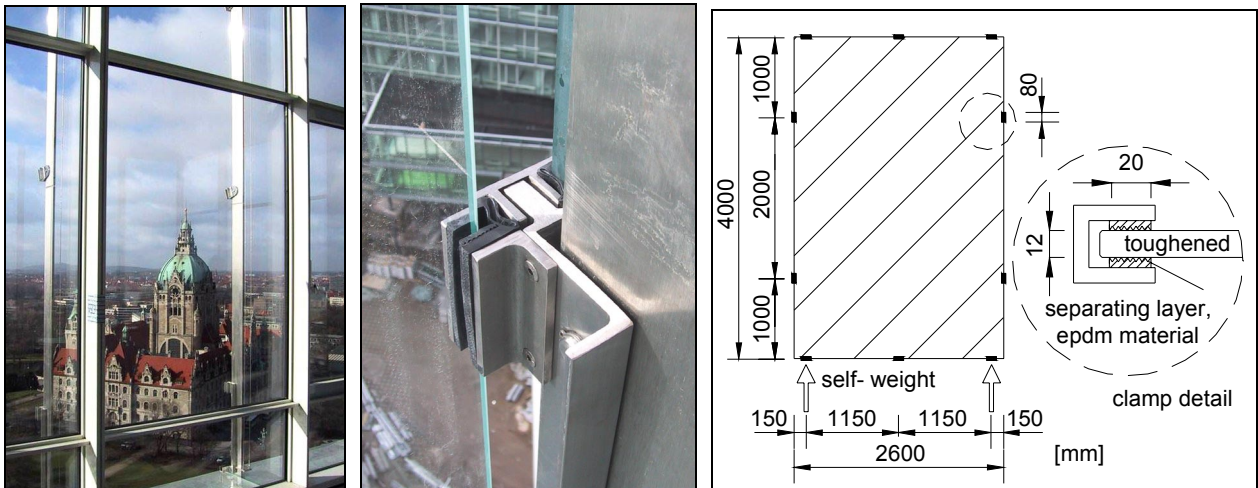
Example of a locally clamped triple façade outer glazing panel, $t = 12\text{mm}$ toughened glass
